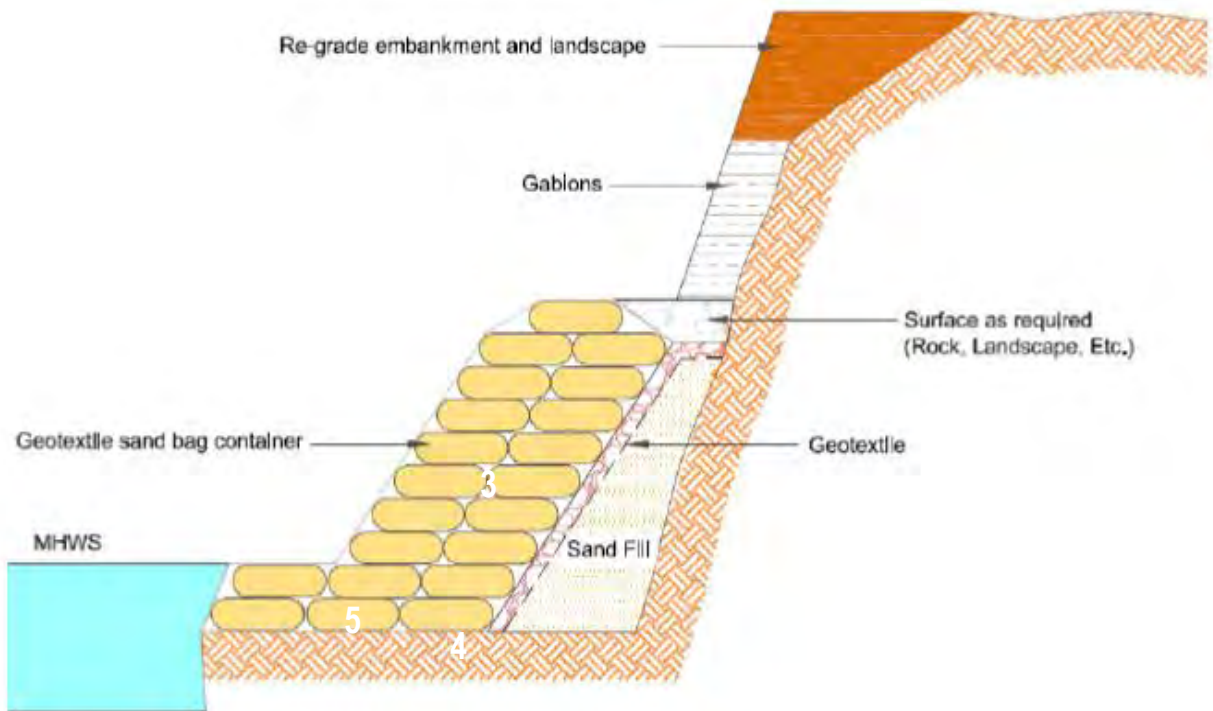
Cross section of geotextile sandbag containers, for Alternative 2.
